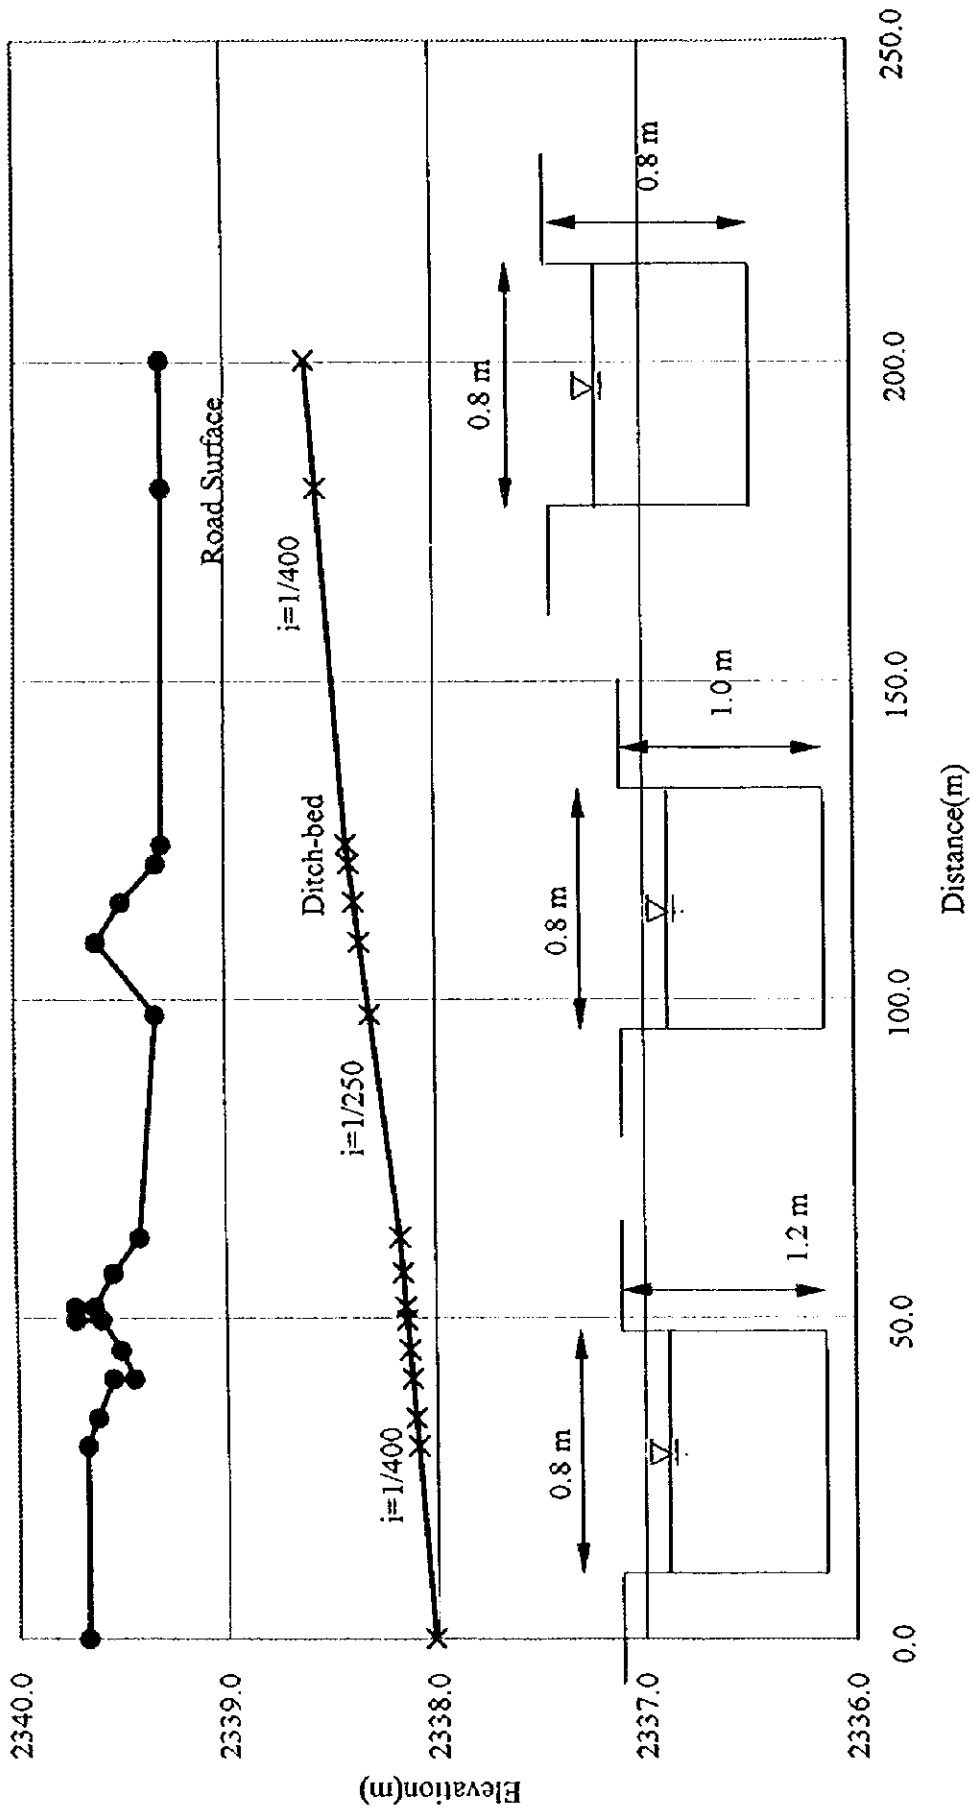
Longitudinal and Cross-sectional Profiles of Drainage Ditch for WS3-1 Basin
